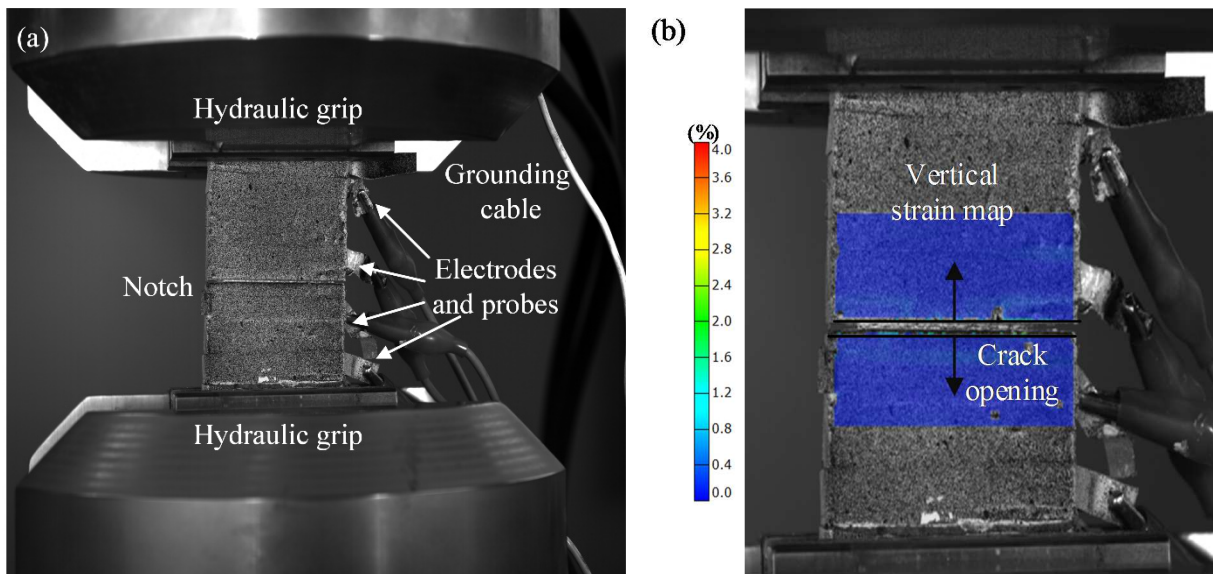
Single crack opening test on C1 with four-probe impedance measurement: (a) test setup; (b) DIC results showed crack opening
